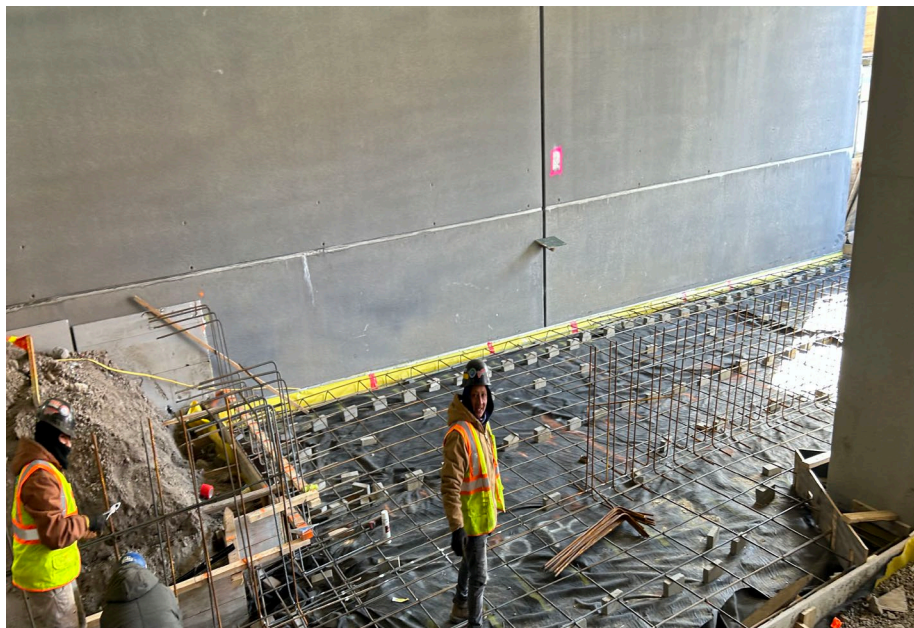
Facing Northeast, progress rebar installation in grid B3.
